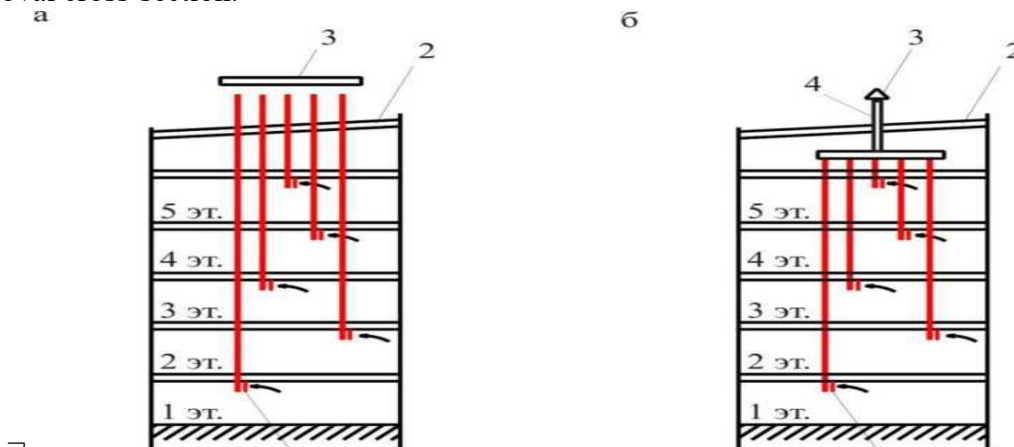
Schemes of vertical duct natural exhaust ventilation systems for buildings up to five floors: a - with separate ducts; b - with ducts combined in the attic; -1 - louvered grilles; 2 - roof; 3 - canopy; 4 - prefabricated
